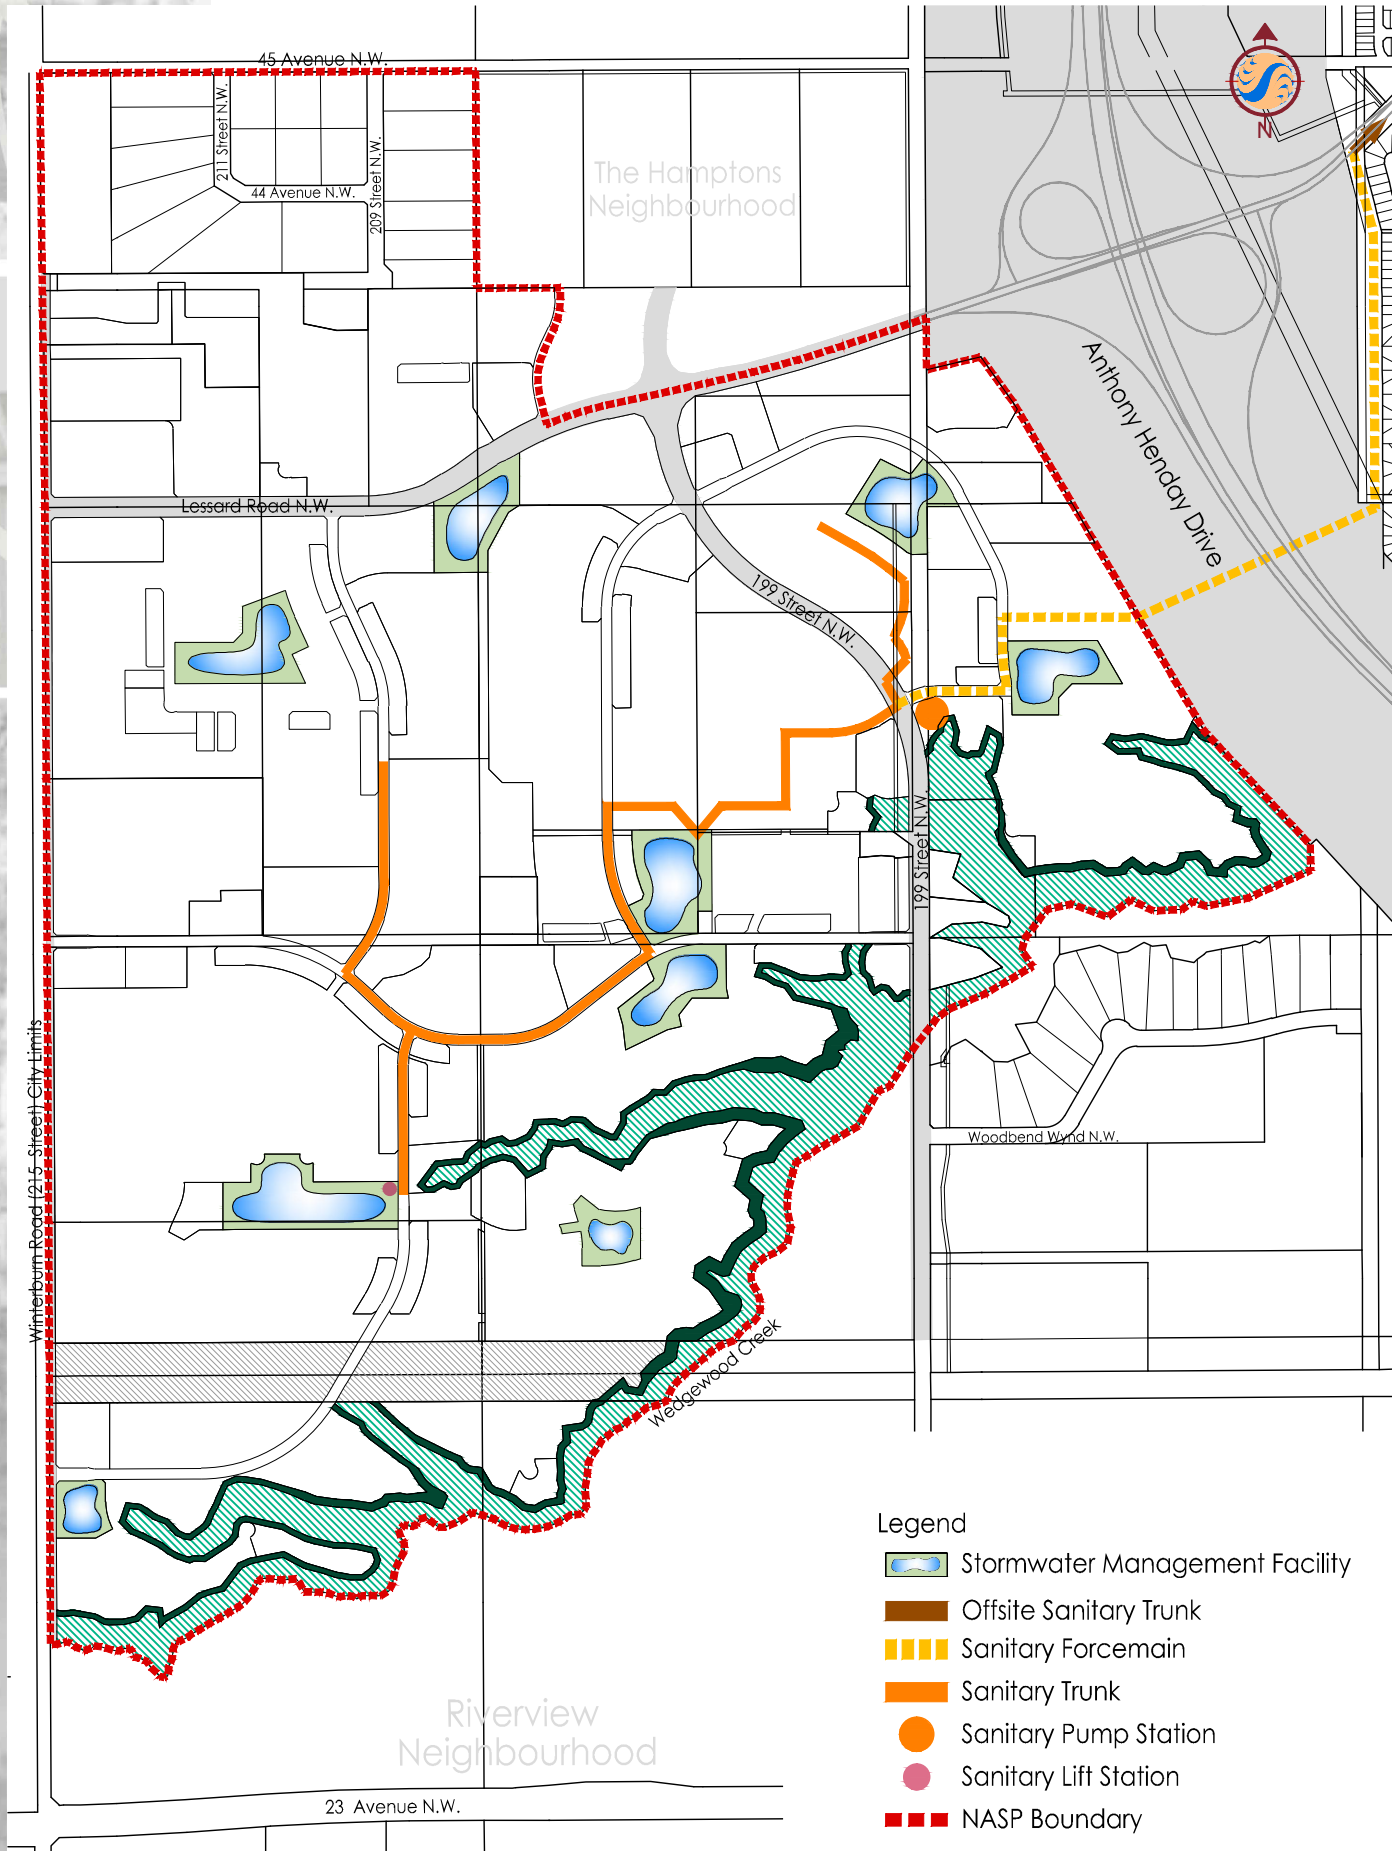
Sanitary Servicing Edgemont Neighbourhood Area Structure Plan
